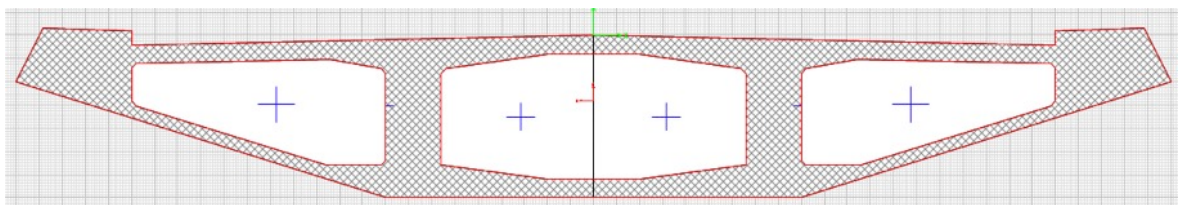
Cross-section of transition between support-4 and abutment-5 in FEM.
